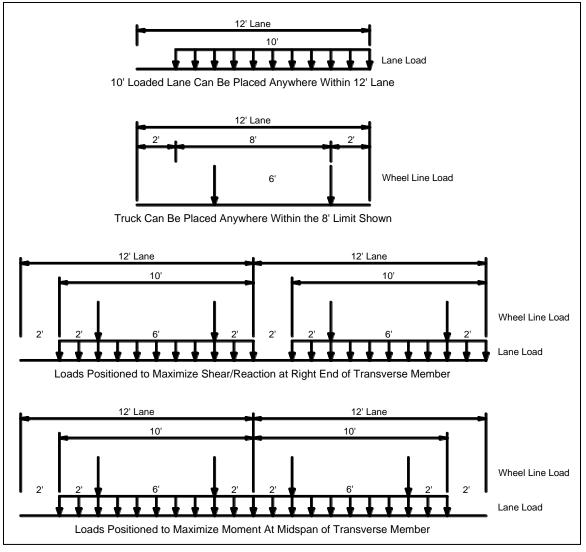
Examples of Live Load Positioning Using the LRFR Method
